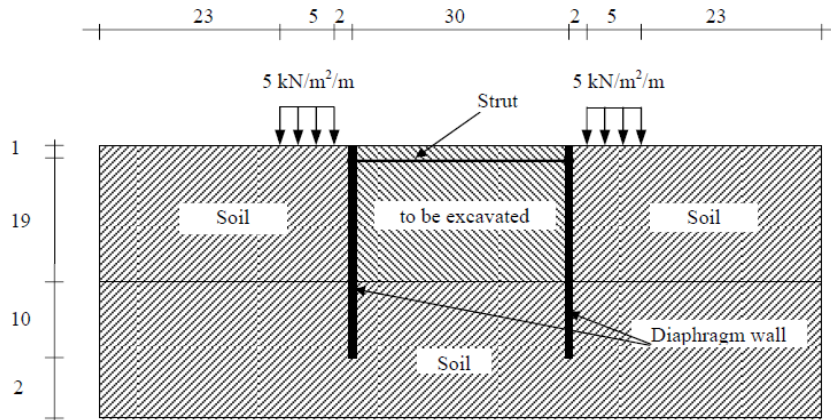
Geometry Model of the Situation of A submerged Excavation at Depth 2m
